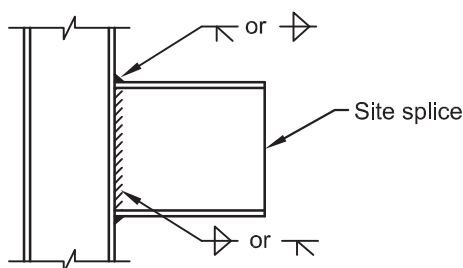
STUB GIRDER CONNECTION, FULLY SHOP WELDED BEAM STUB, BEAM SPLICED ON SITE
